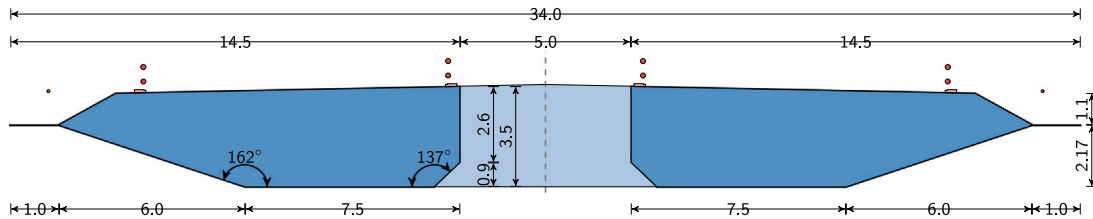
Central-slotted box girder of Xihoumen bridge.
